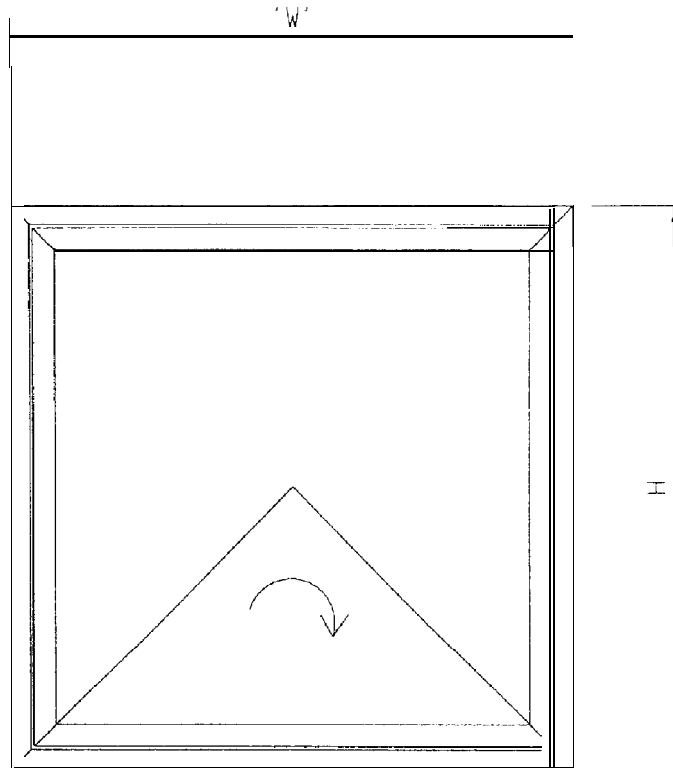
LAYOUT FOR MILA VIKING 'H' TOP SWING GEAR
